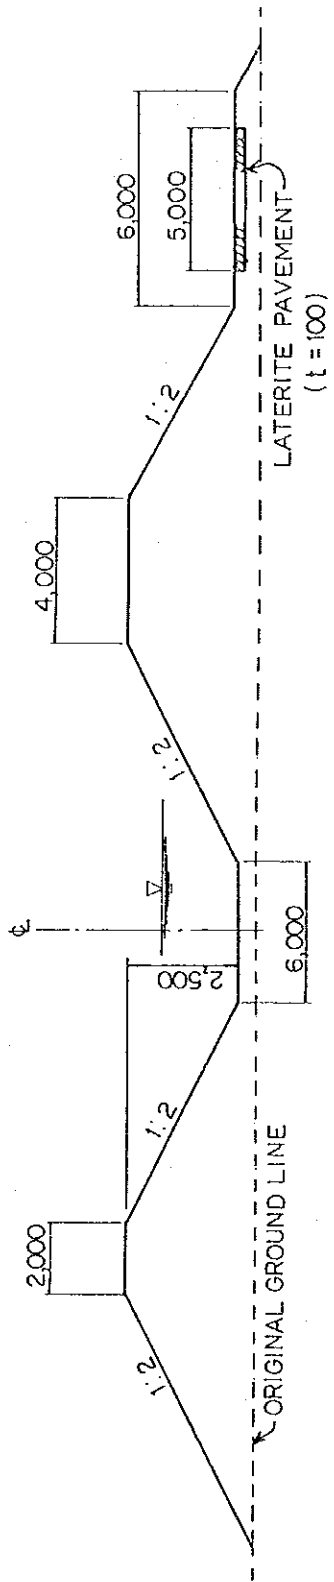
TYPICAL CROSS SECTION OF LINK CANAL
